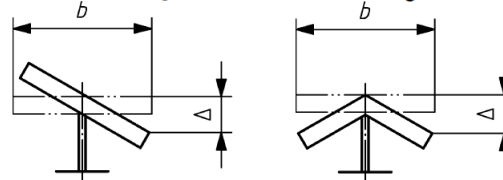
Tolerances of flanges of welded profiles
